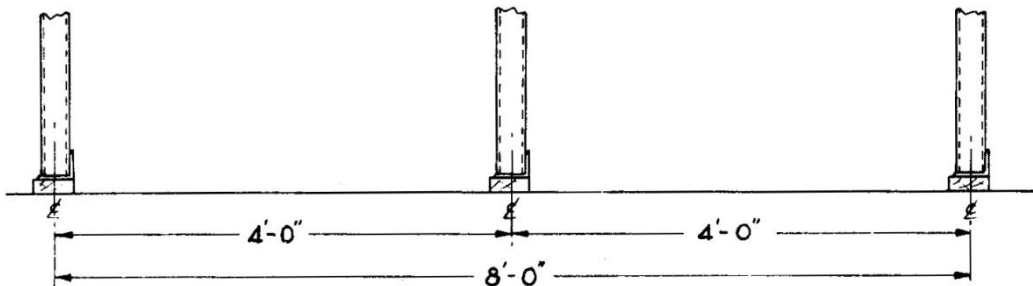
STANDARD AISLE DIMENSION FOR LONG LINE EQUIPMENT.
